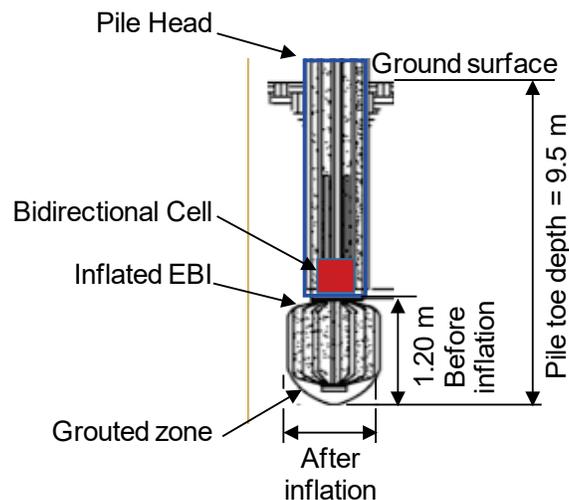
Sketch showing the EB and BD arrangement (not to scale).
